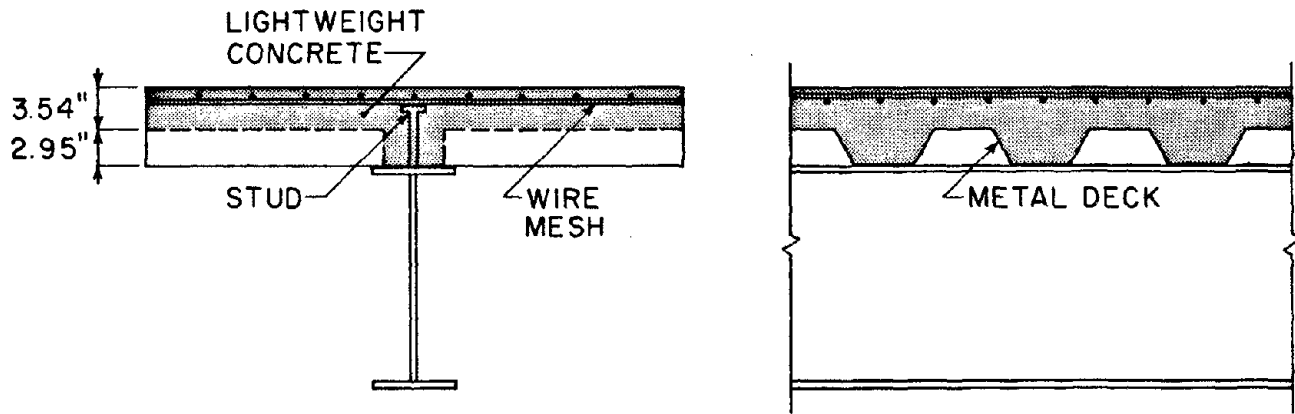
COMPOSITE GIRDER CROSS SECTIONS (FRAME B)
